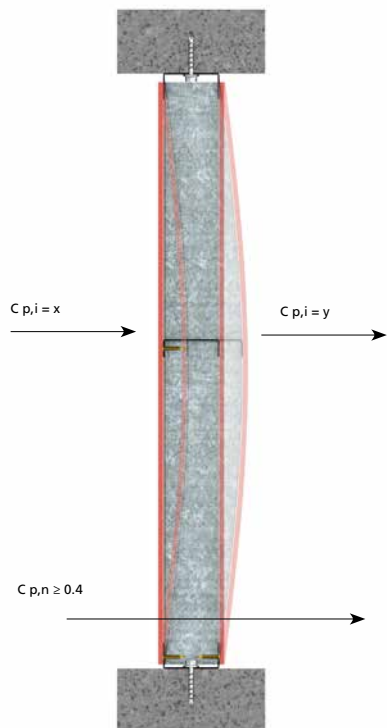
(C): PRESSURE SEALED SINGLE SKIN WALL
